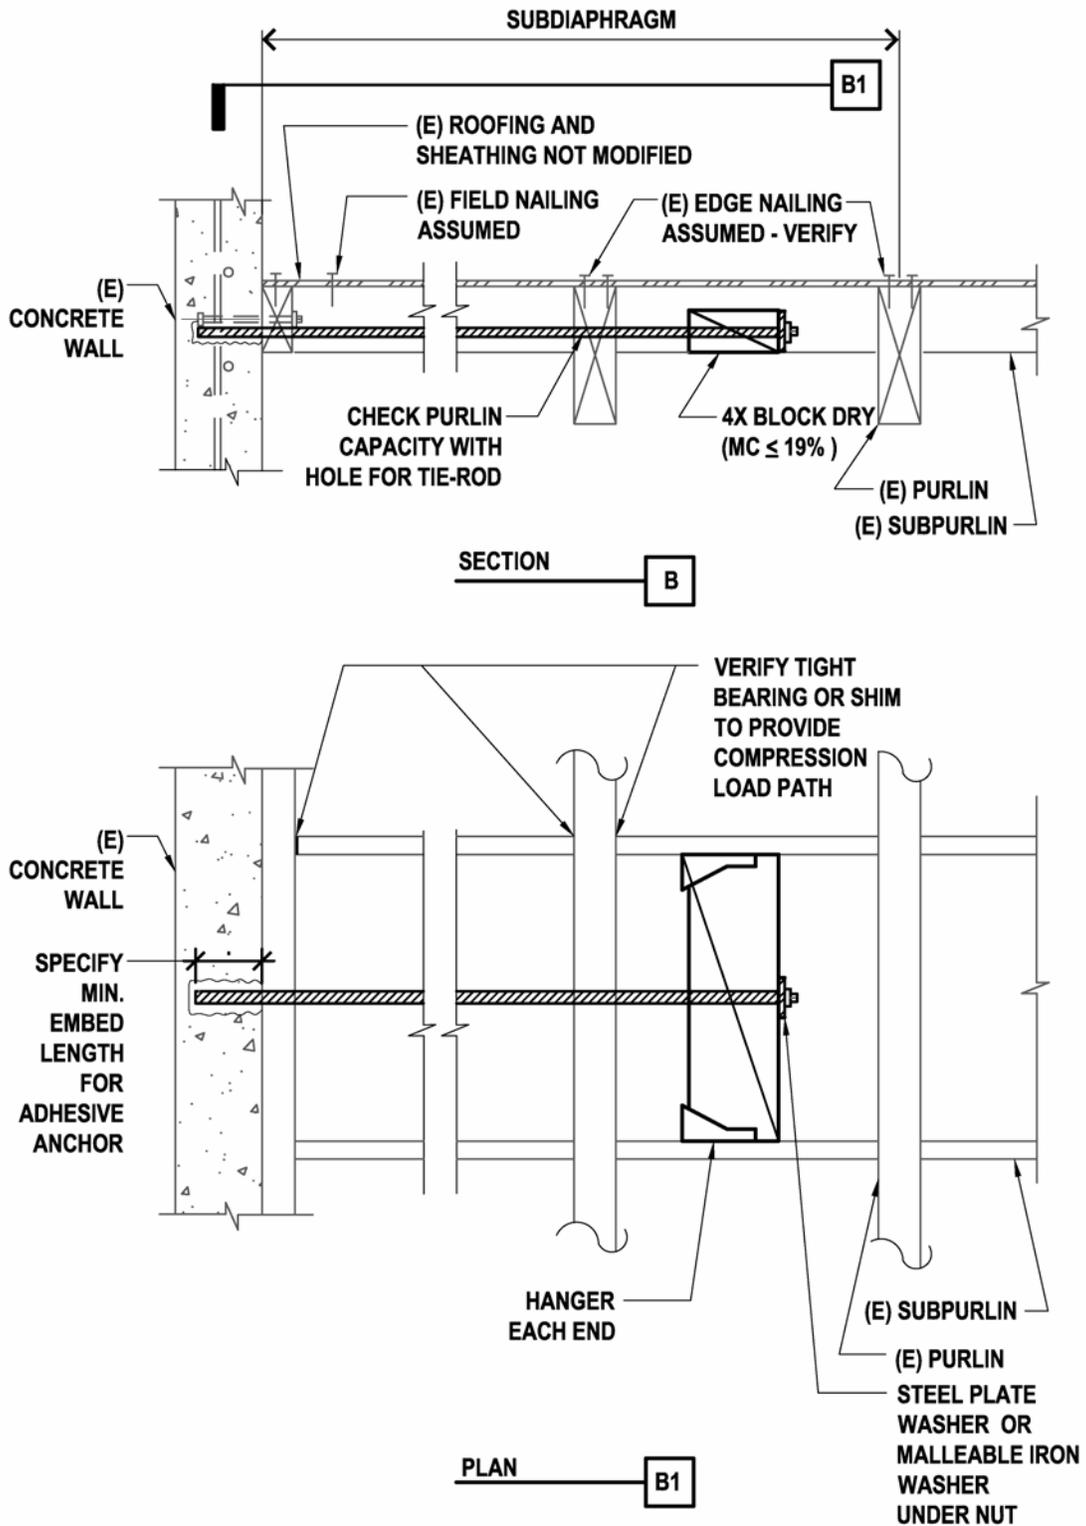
B: Wall Out-of-Plane Anchorage for Flexible Wood Diaphragm at Subpurlins – Roofing Not Removed
